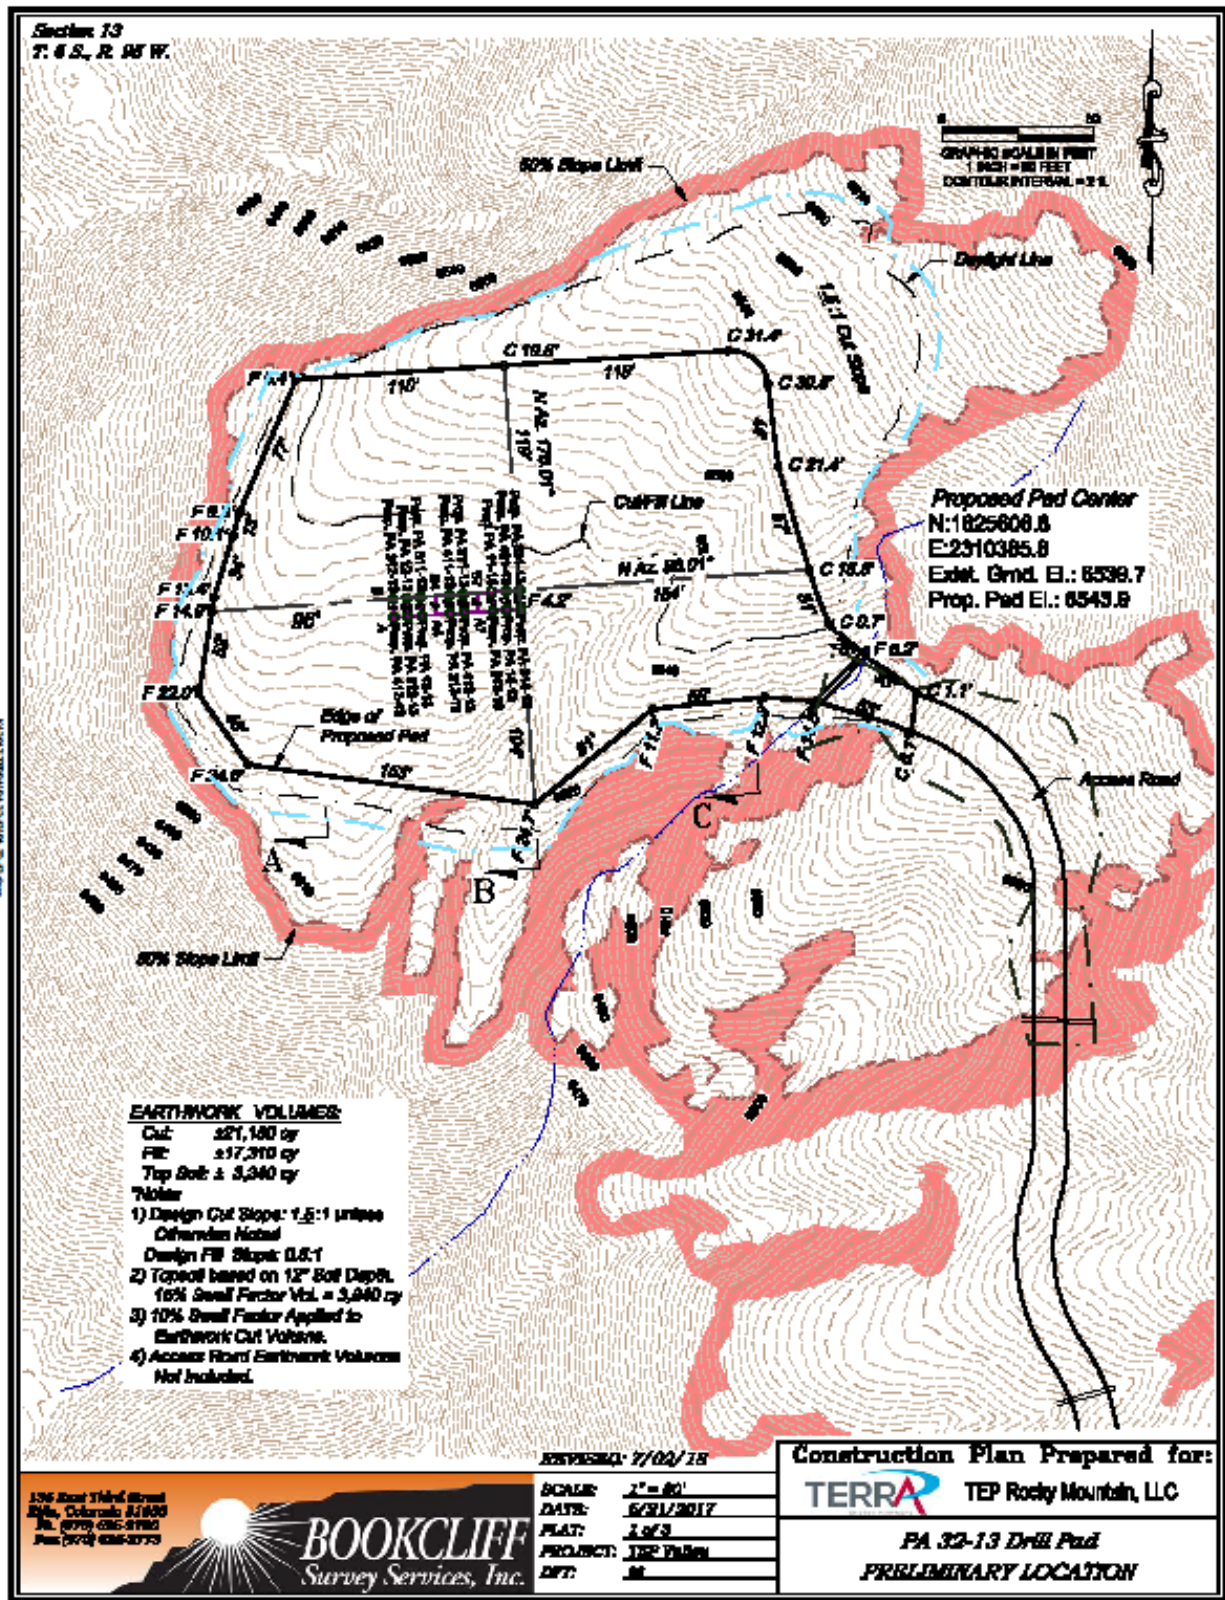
Construction Layout for PA 32-13 Pad – Preferred Alternative
